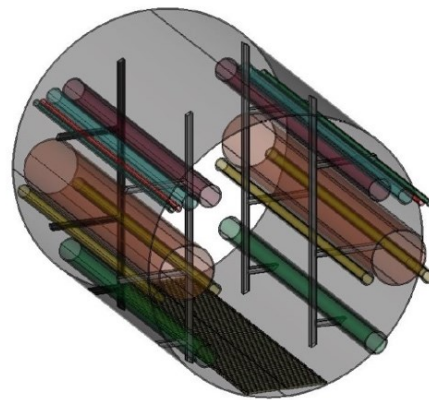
3D rendering of steel tunnel design (BYU, 2015)
